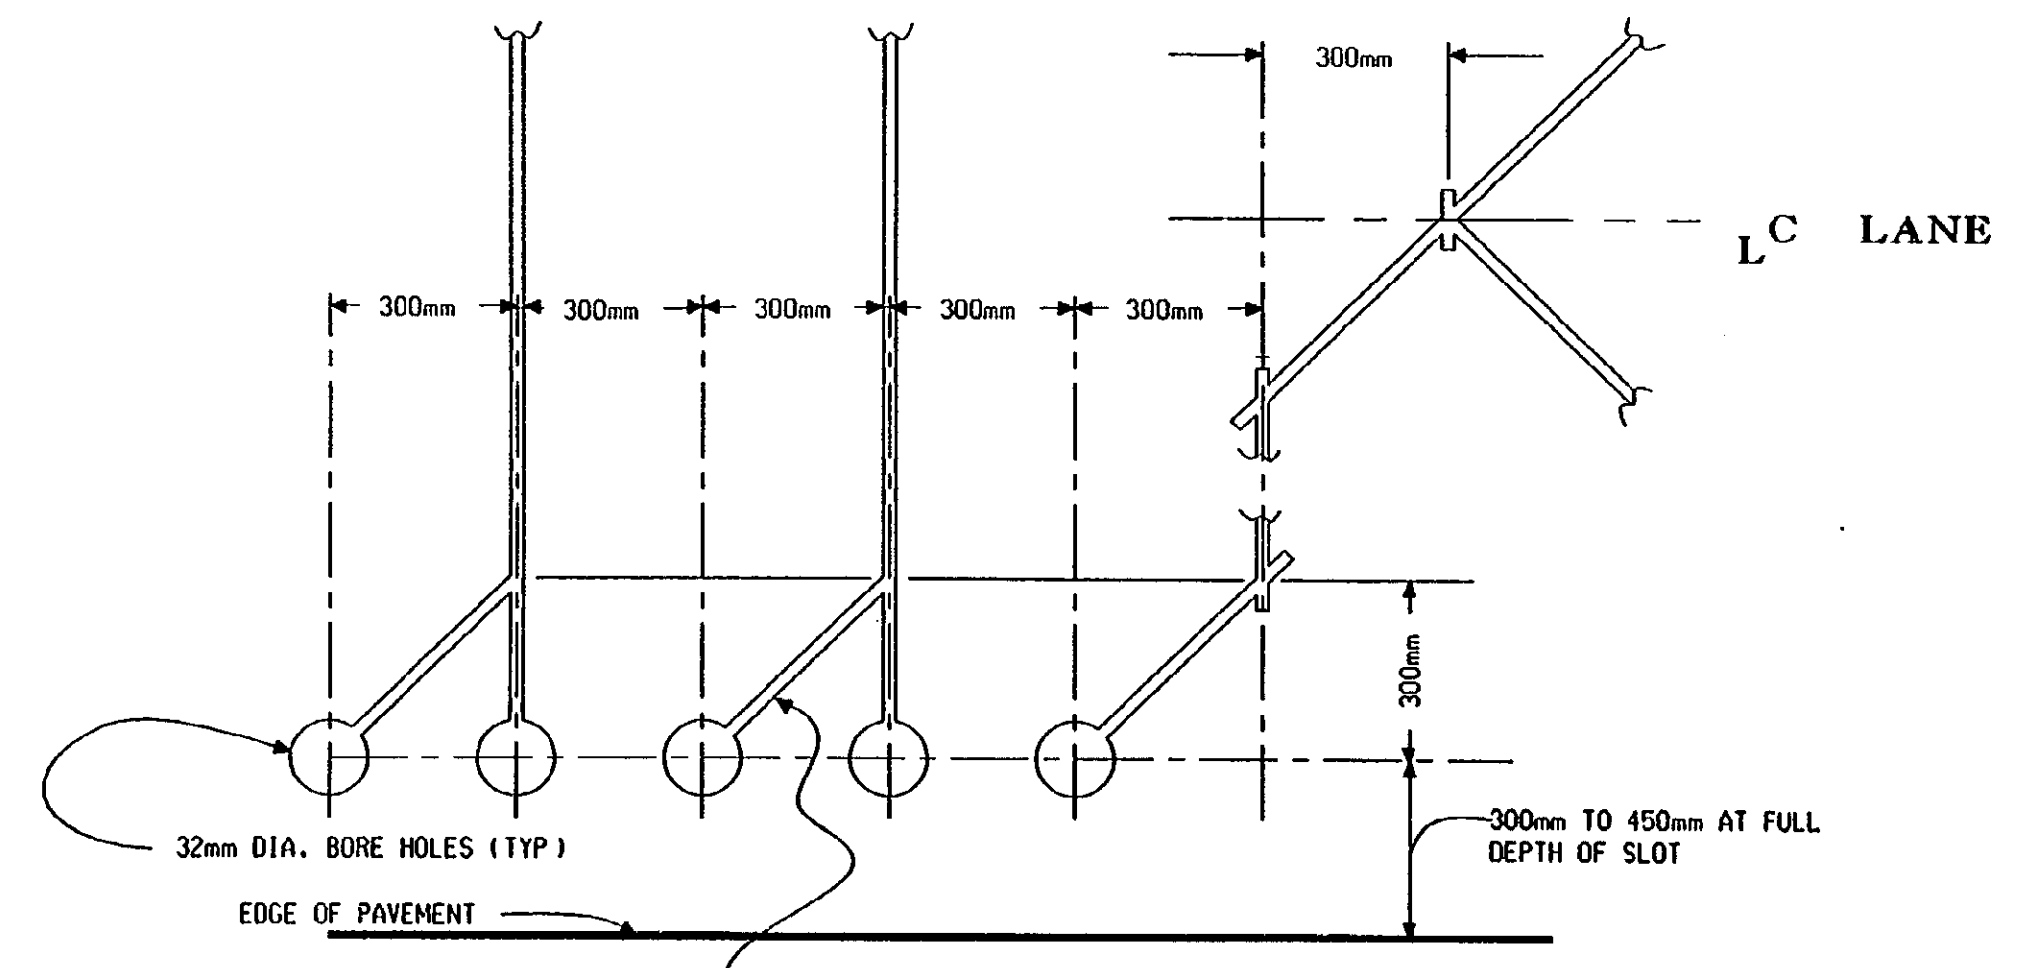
DETAIL "K" LONGITUDINAL JOINT CROSSING PROTECTION
